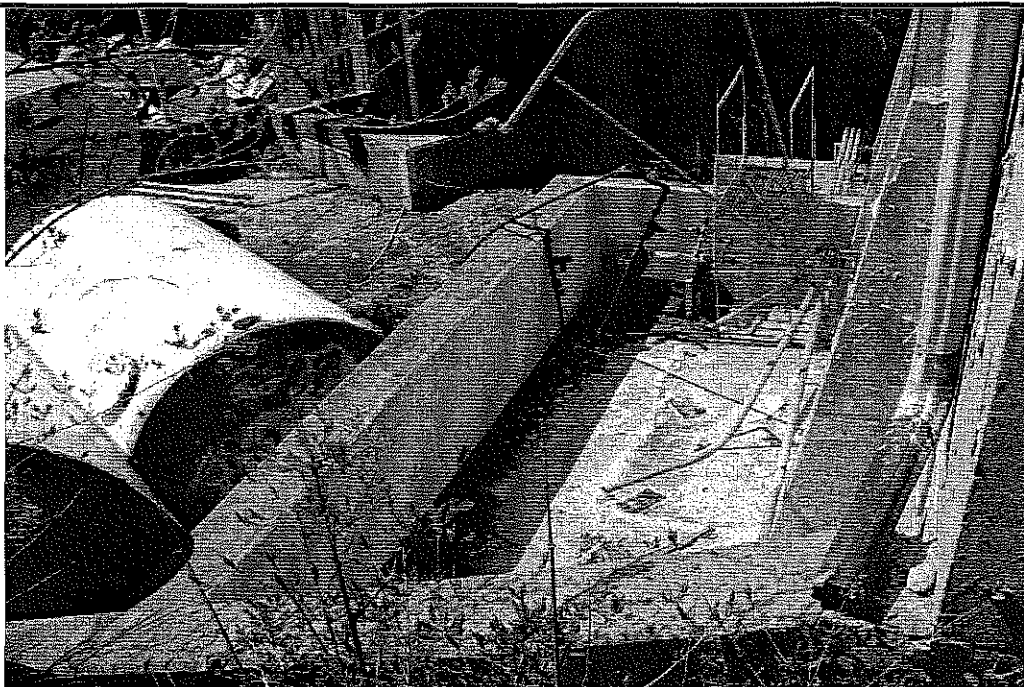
View looking at concrete containment structure that surrounding the former solvent ASTs, AOC-1
